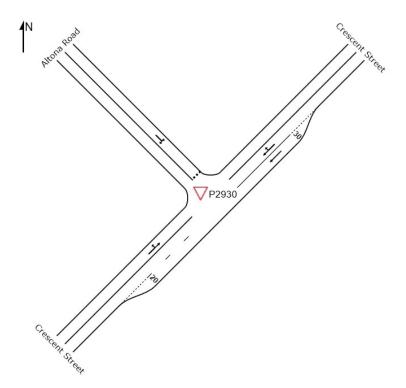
Crescent Street / Altona Road Intersection Layout
